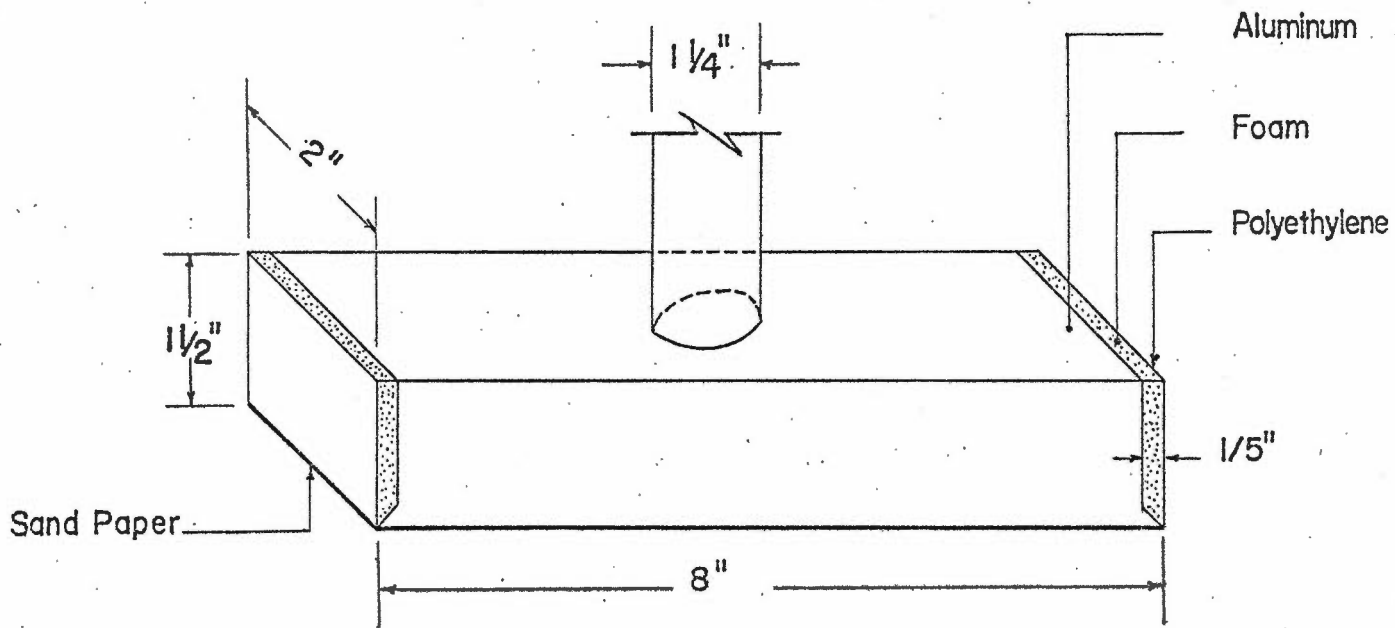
MODEL STRIP FOOTING FOR VERTICAL LOADS
